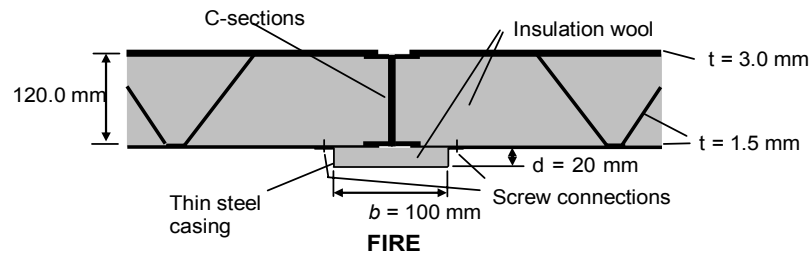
Cross-section of test specimens showing seam between floor panels in large scale test.
